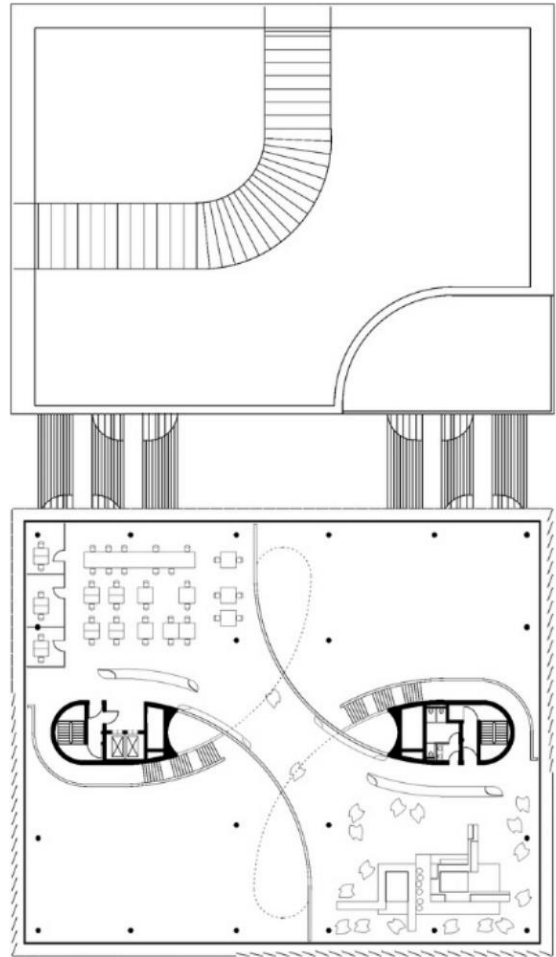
FIFTH FLOOR PLAN (HENN, 2018)
